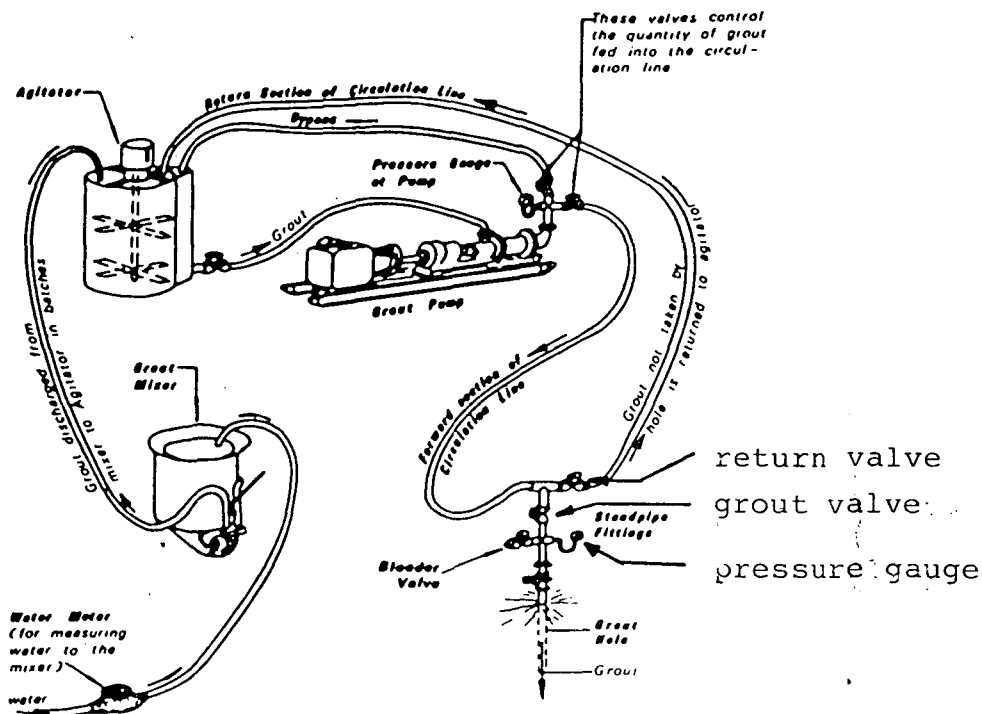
Typical Grouting Equipment (after Houlsby)
